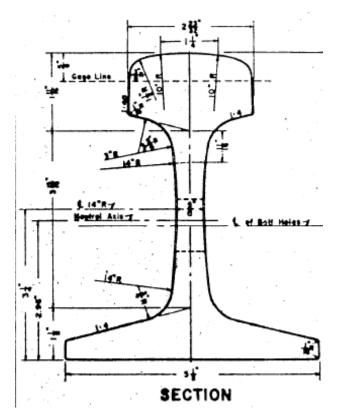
115 LB RE Rail, Cross Section, Dimensions in Inches.
